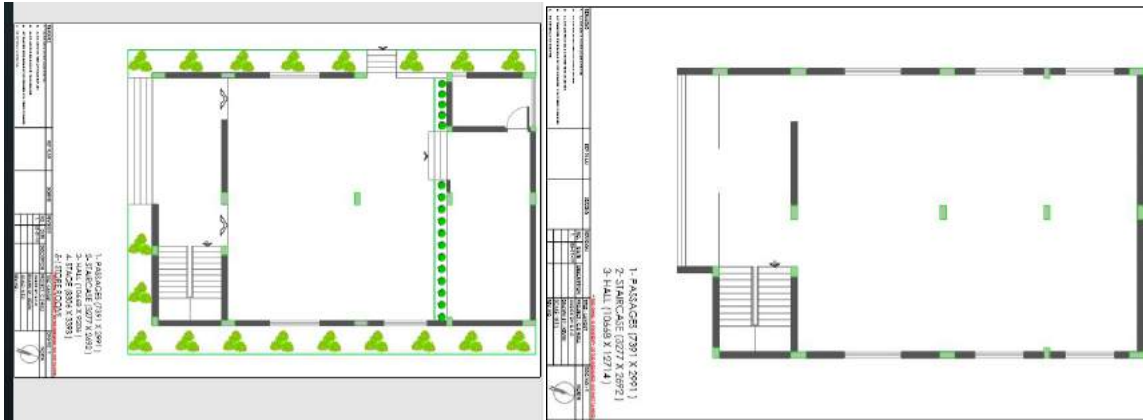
Plan of community hall Fig.13.2.3 First floor plan of community hall
